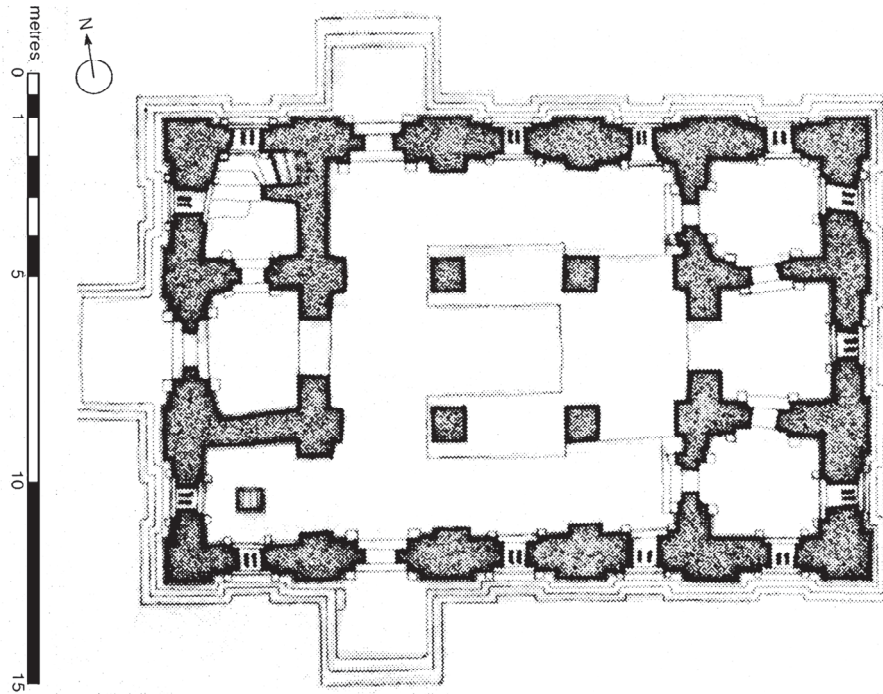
Church of Lalibäla Amanu'el, Wällo, floor plan; after L. Bianchi Barriviera
